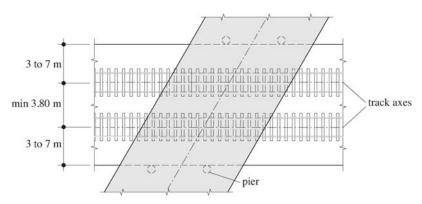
Required minimum distance to the piers for a bridge crossing over a railway line.
